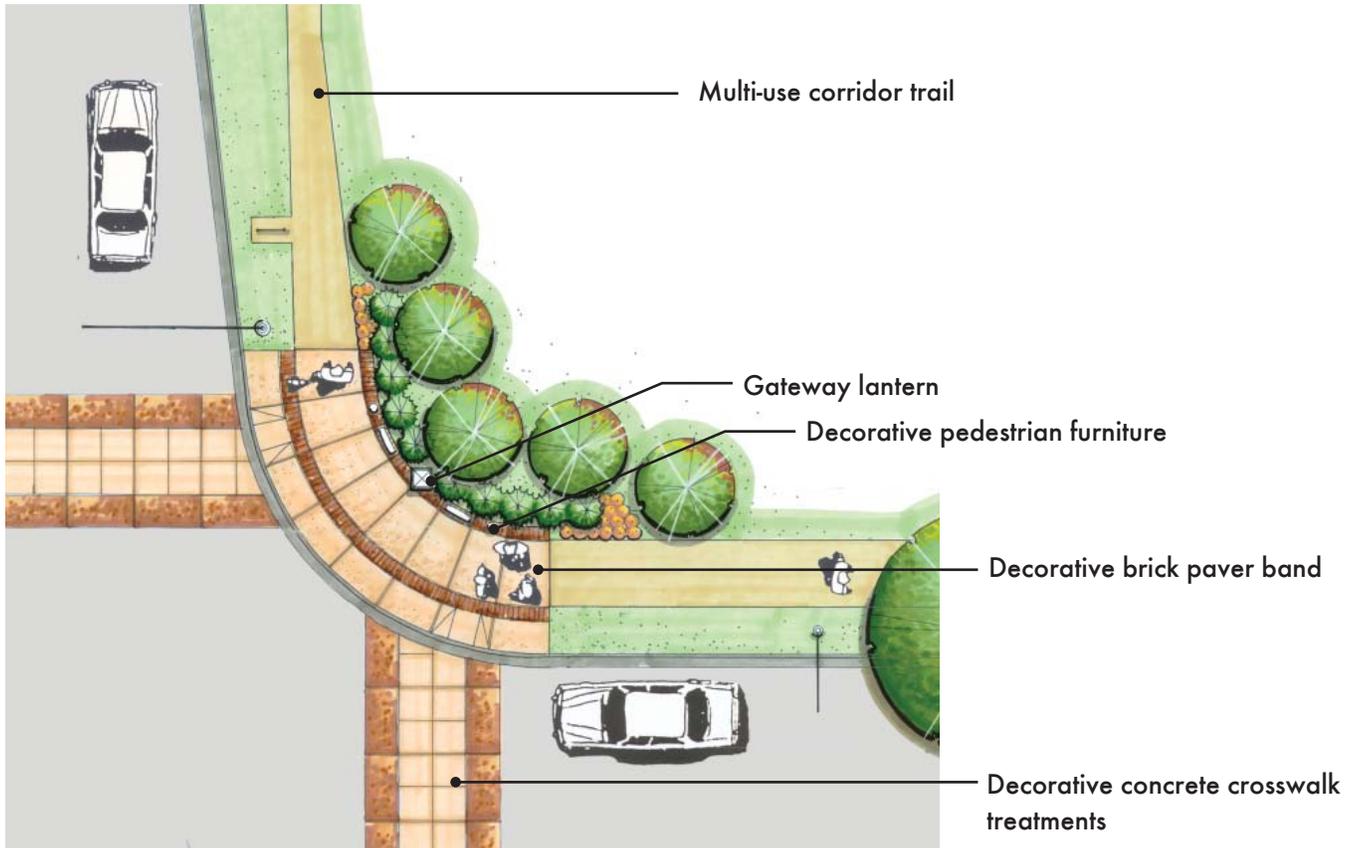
Enlarged plan of pedestrian node at a typical primary intersection illustrating the typical placement of the proposed gateway lanterns. Gateway lanterns occur at specific locations and act as a complement to the town gateway at SR 32 and Gray Road.
